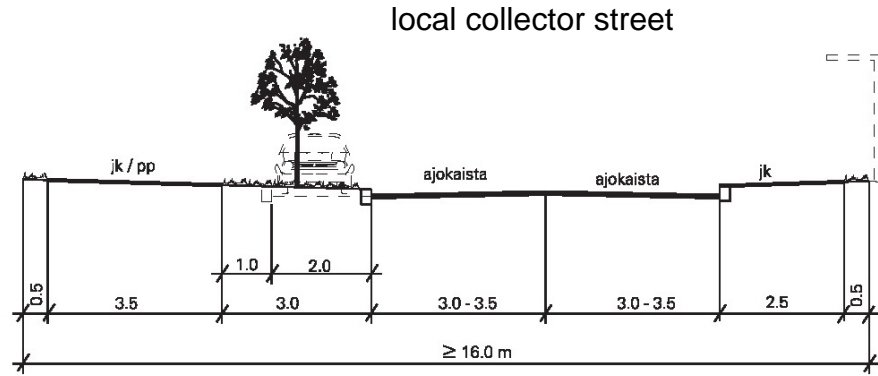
Cross section for local collector street in city of Helsinki. (Planning cross sections for streets, 2001)
